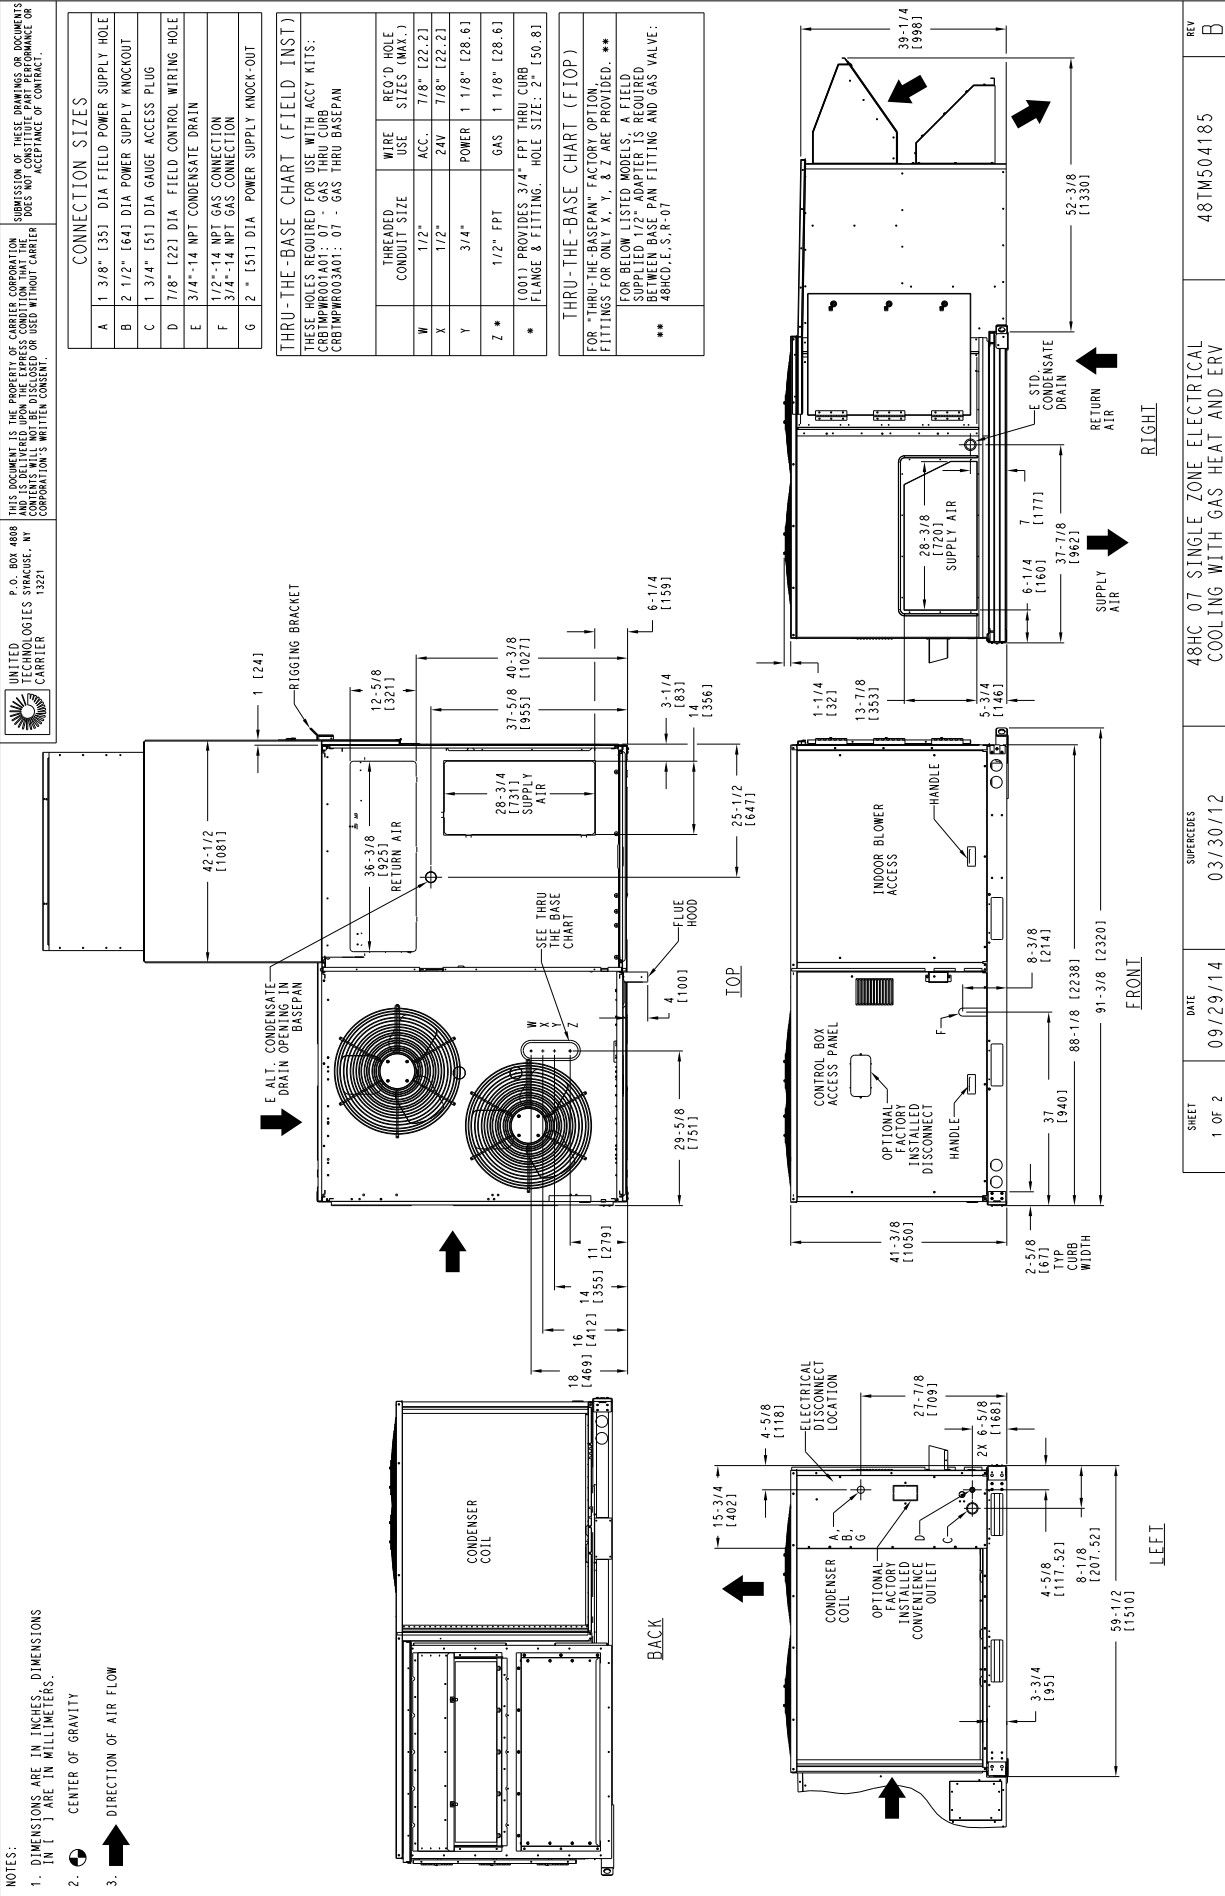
48HC-07 Single Zone Electric Cooling with Gas Heat and ERV (Sheet 1 of 2)
